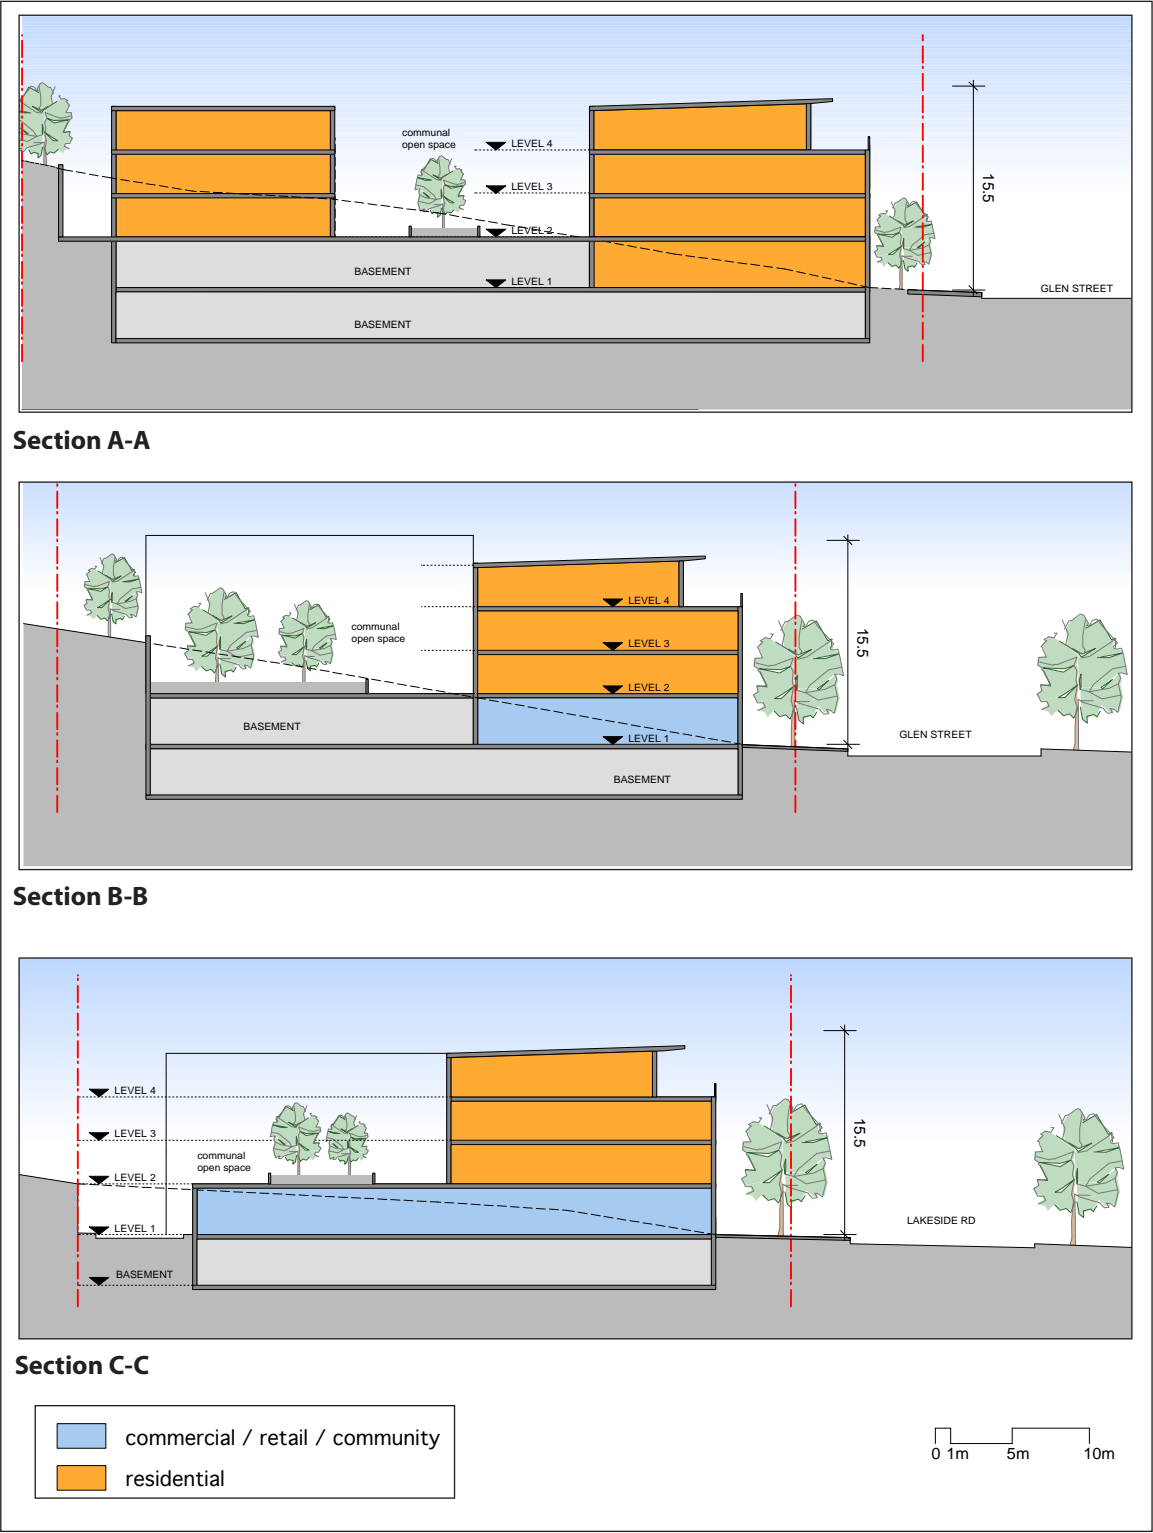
Glen Street and Lakeside Road Precinct Building Height Control Sections -- to be read in conjunction with Ryde LEP 2014
